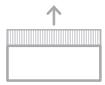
2.81; this acts as a bathroom wall that could be prefabricated and taken to site, used in the communal campground buildings to service two bathrooms on either wall side
